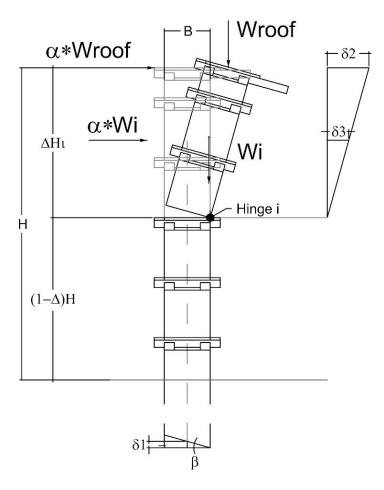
Roof force + Wall force - Overturning Blocks - a critical
